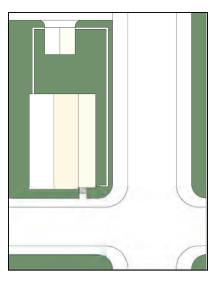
Plan View, Side Yard House (Illustrative)
